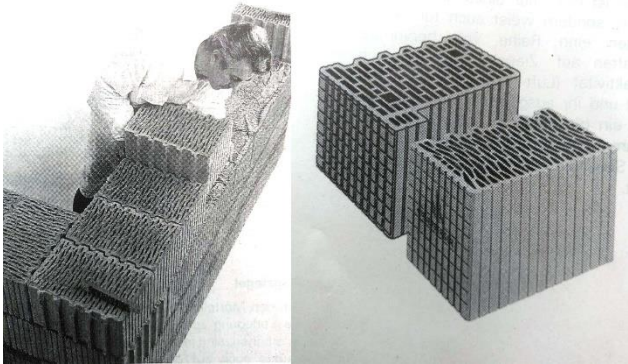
, Source: (Riccabona, 2004) Top view of a VPB and assembly.
